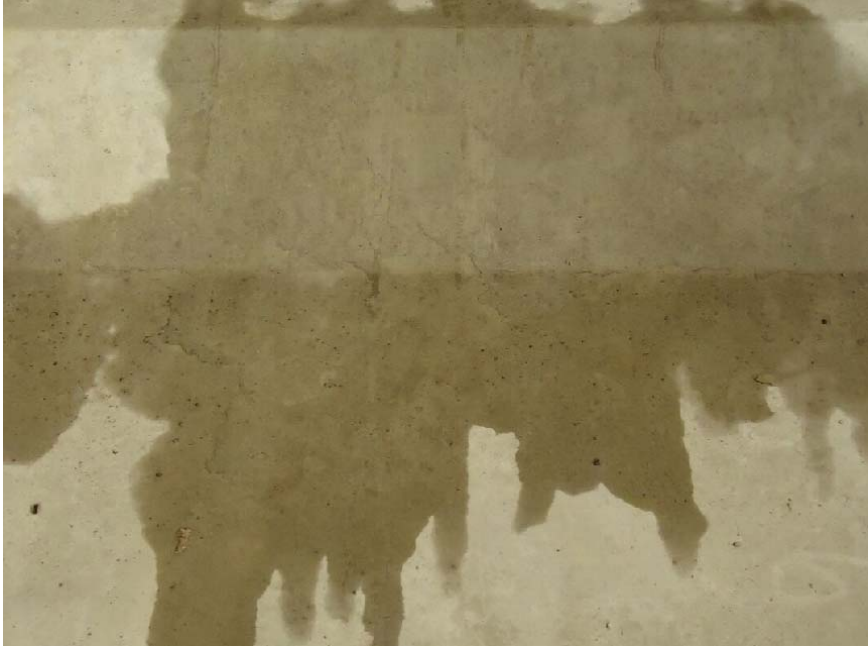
Horizontal crack along top flange and web interface (3N-E)
